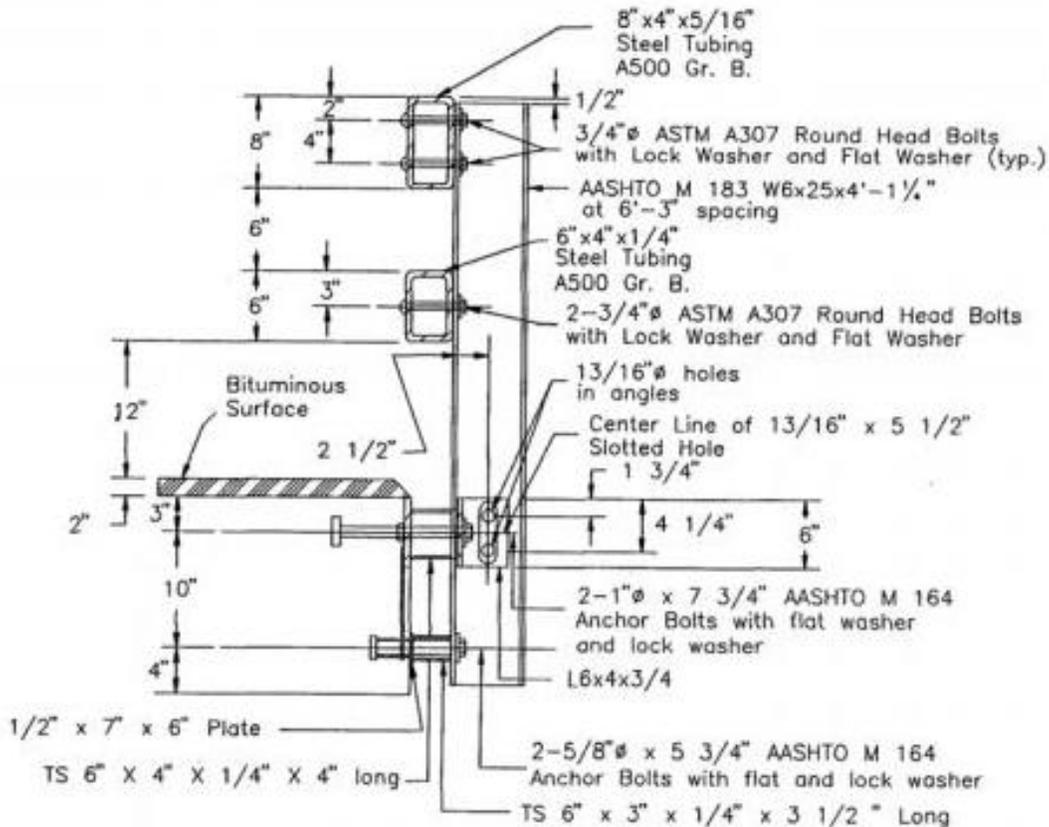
Illinois Side-Mounted Bridge Rail [20]
